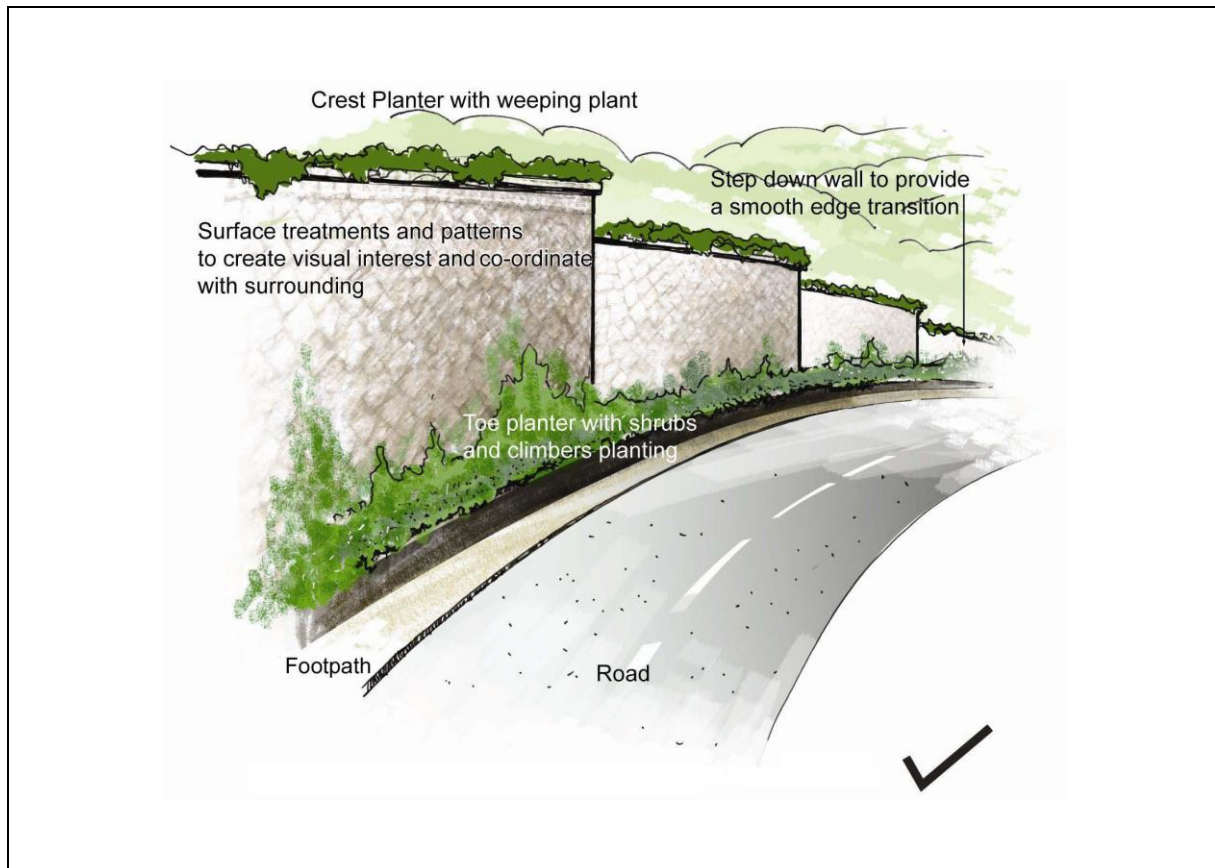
Barrier Wall with Step Down Edge Treatment
